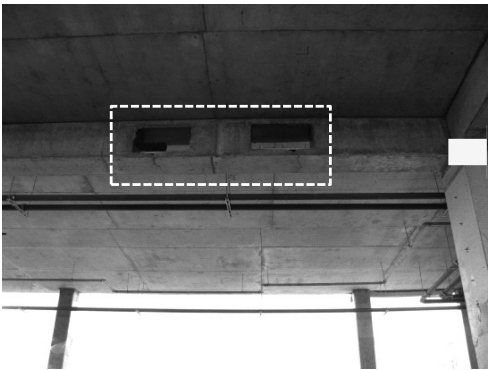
Defectively designed openings in beam (cracked lower strip)
